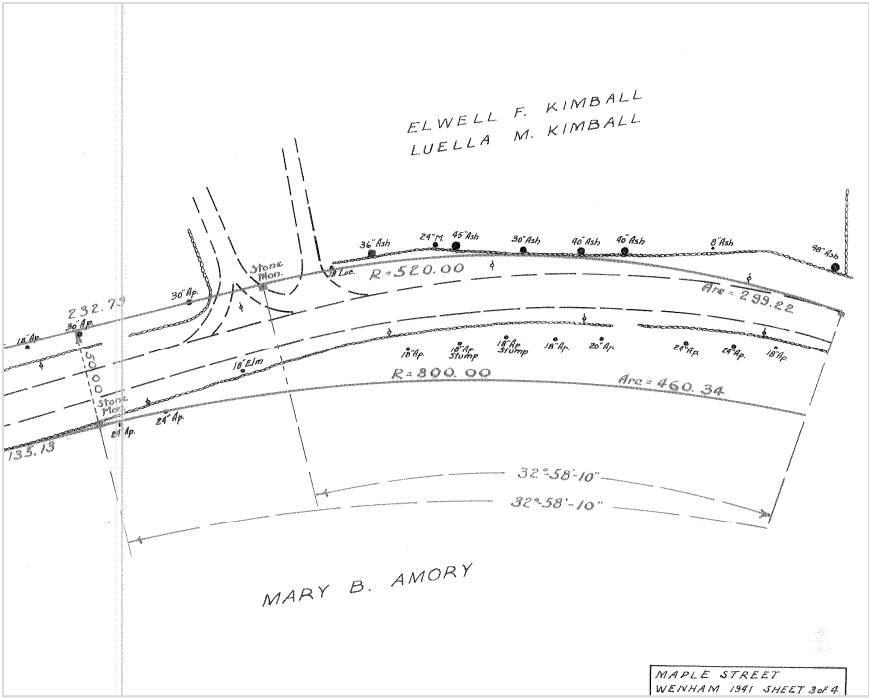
1941 plan showing the former driveway, and stone wall along Maple Street.⁴
